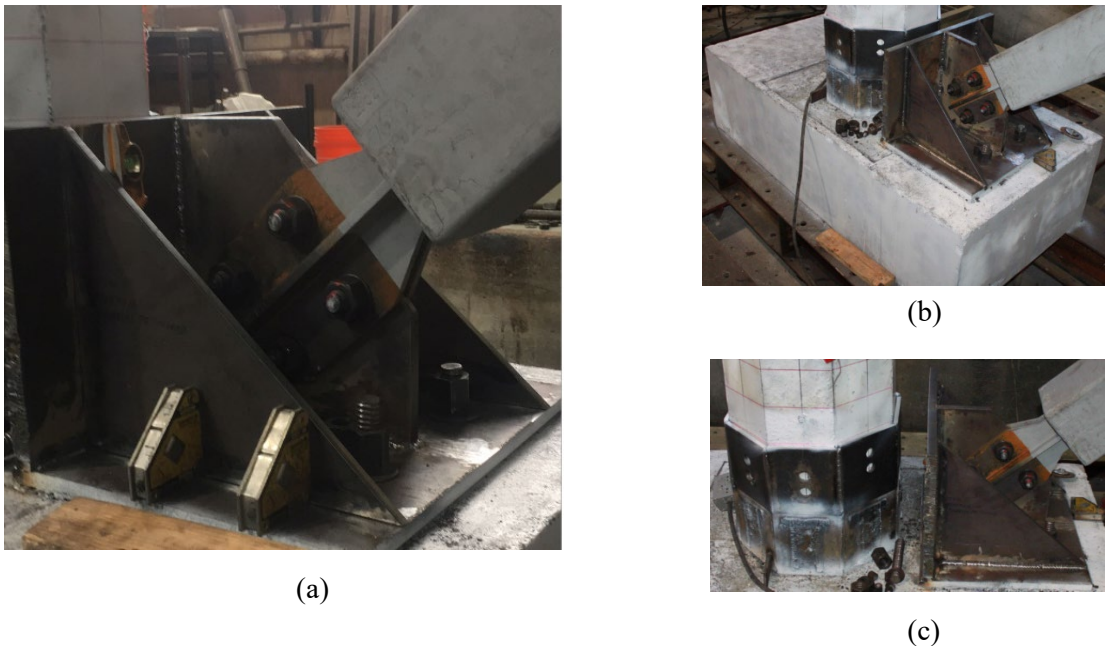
Lower gusset assembly details: (a) stiffener in the lower gusset assembly; (b) lower gusset in footing; (c) gusset assembly and gap
